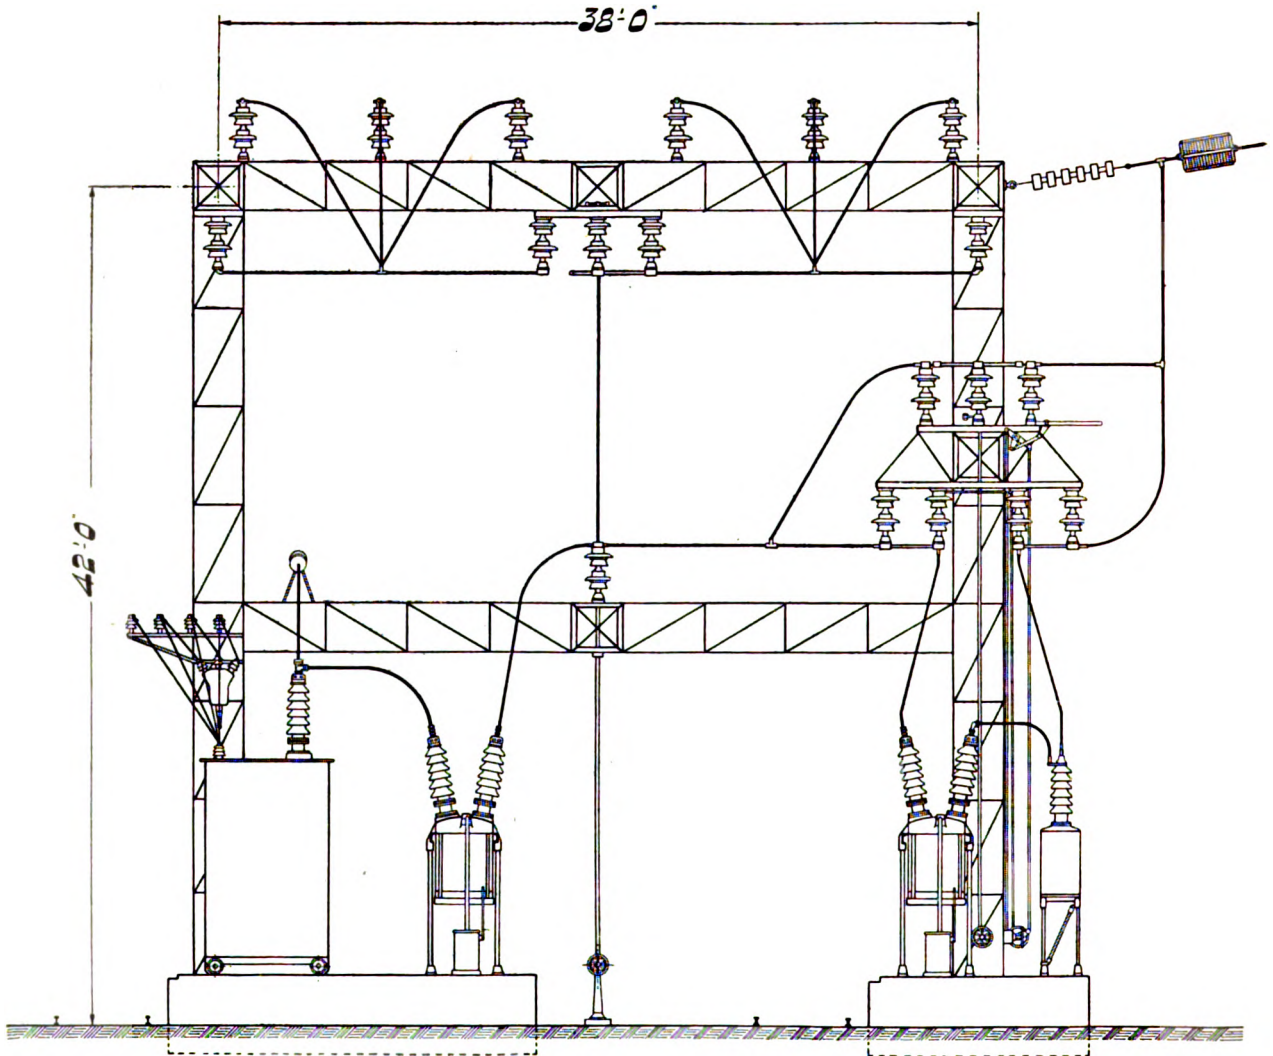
Layout of 66-kV outdoor station. Sectional elevation.
